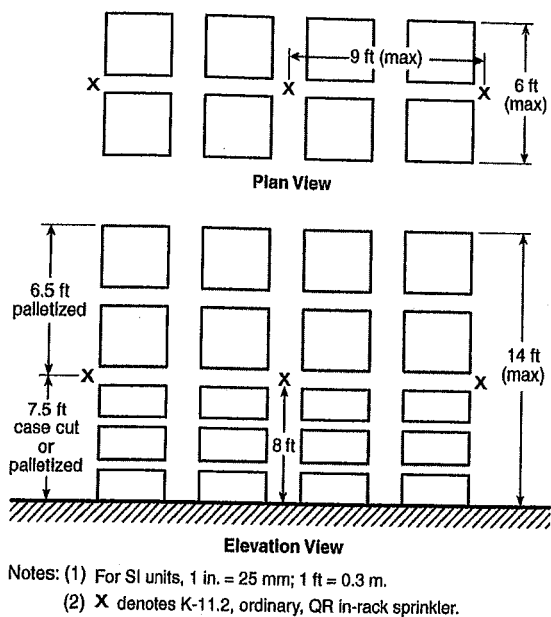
(a) Double-Row Rack Sprinkler Layout G. [30: Figure 16.6.4(a)]
